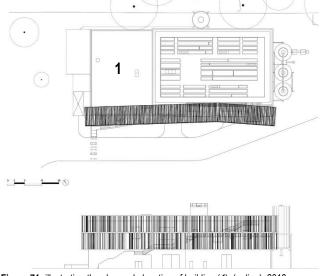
illustrating the plan and elevation of building (1), (online). 2018.
